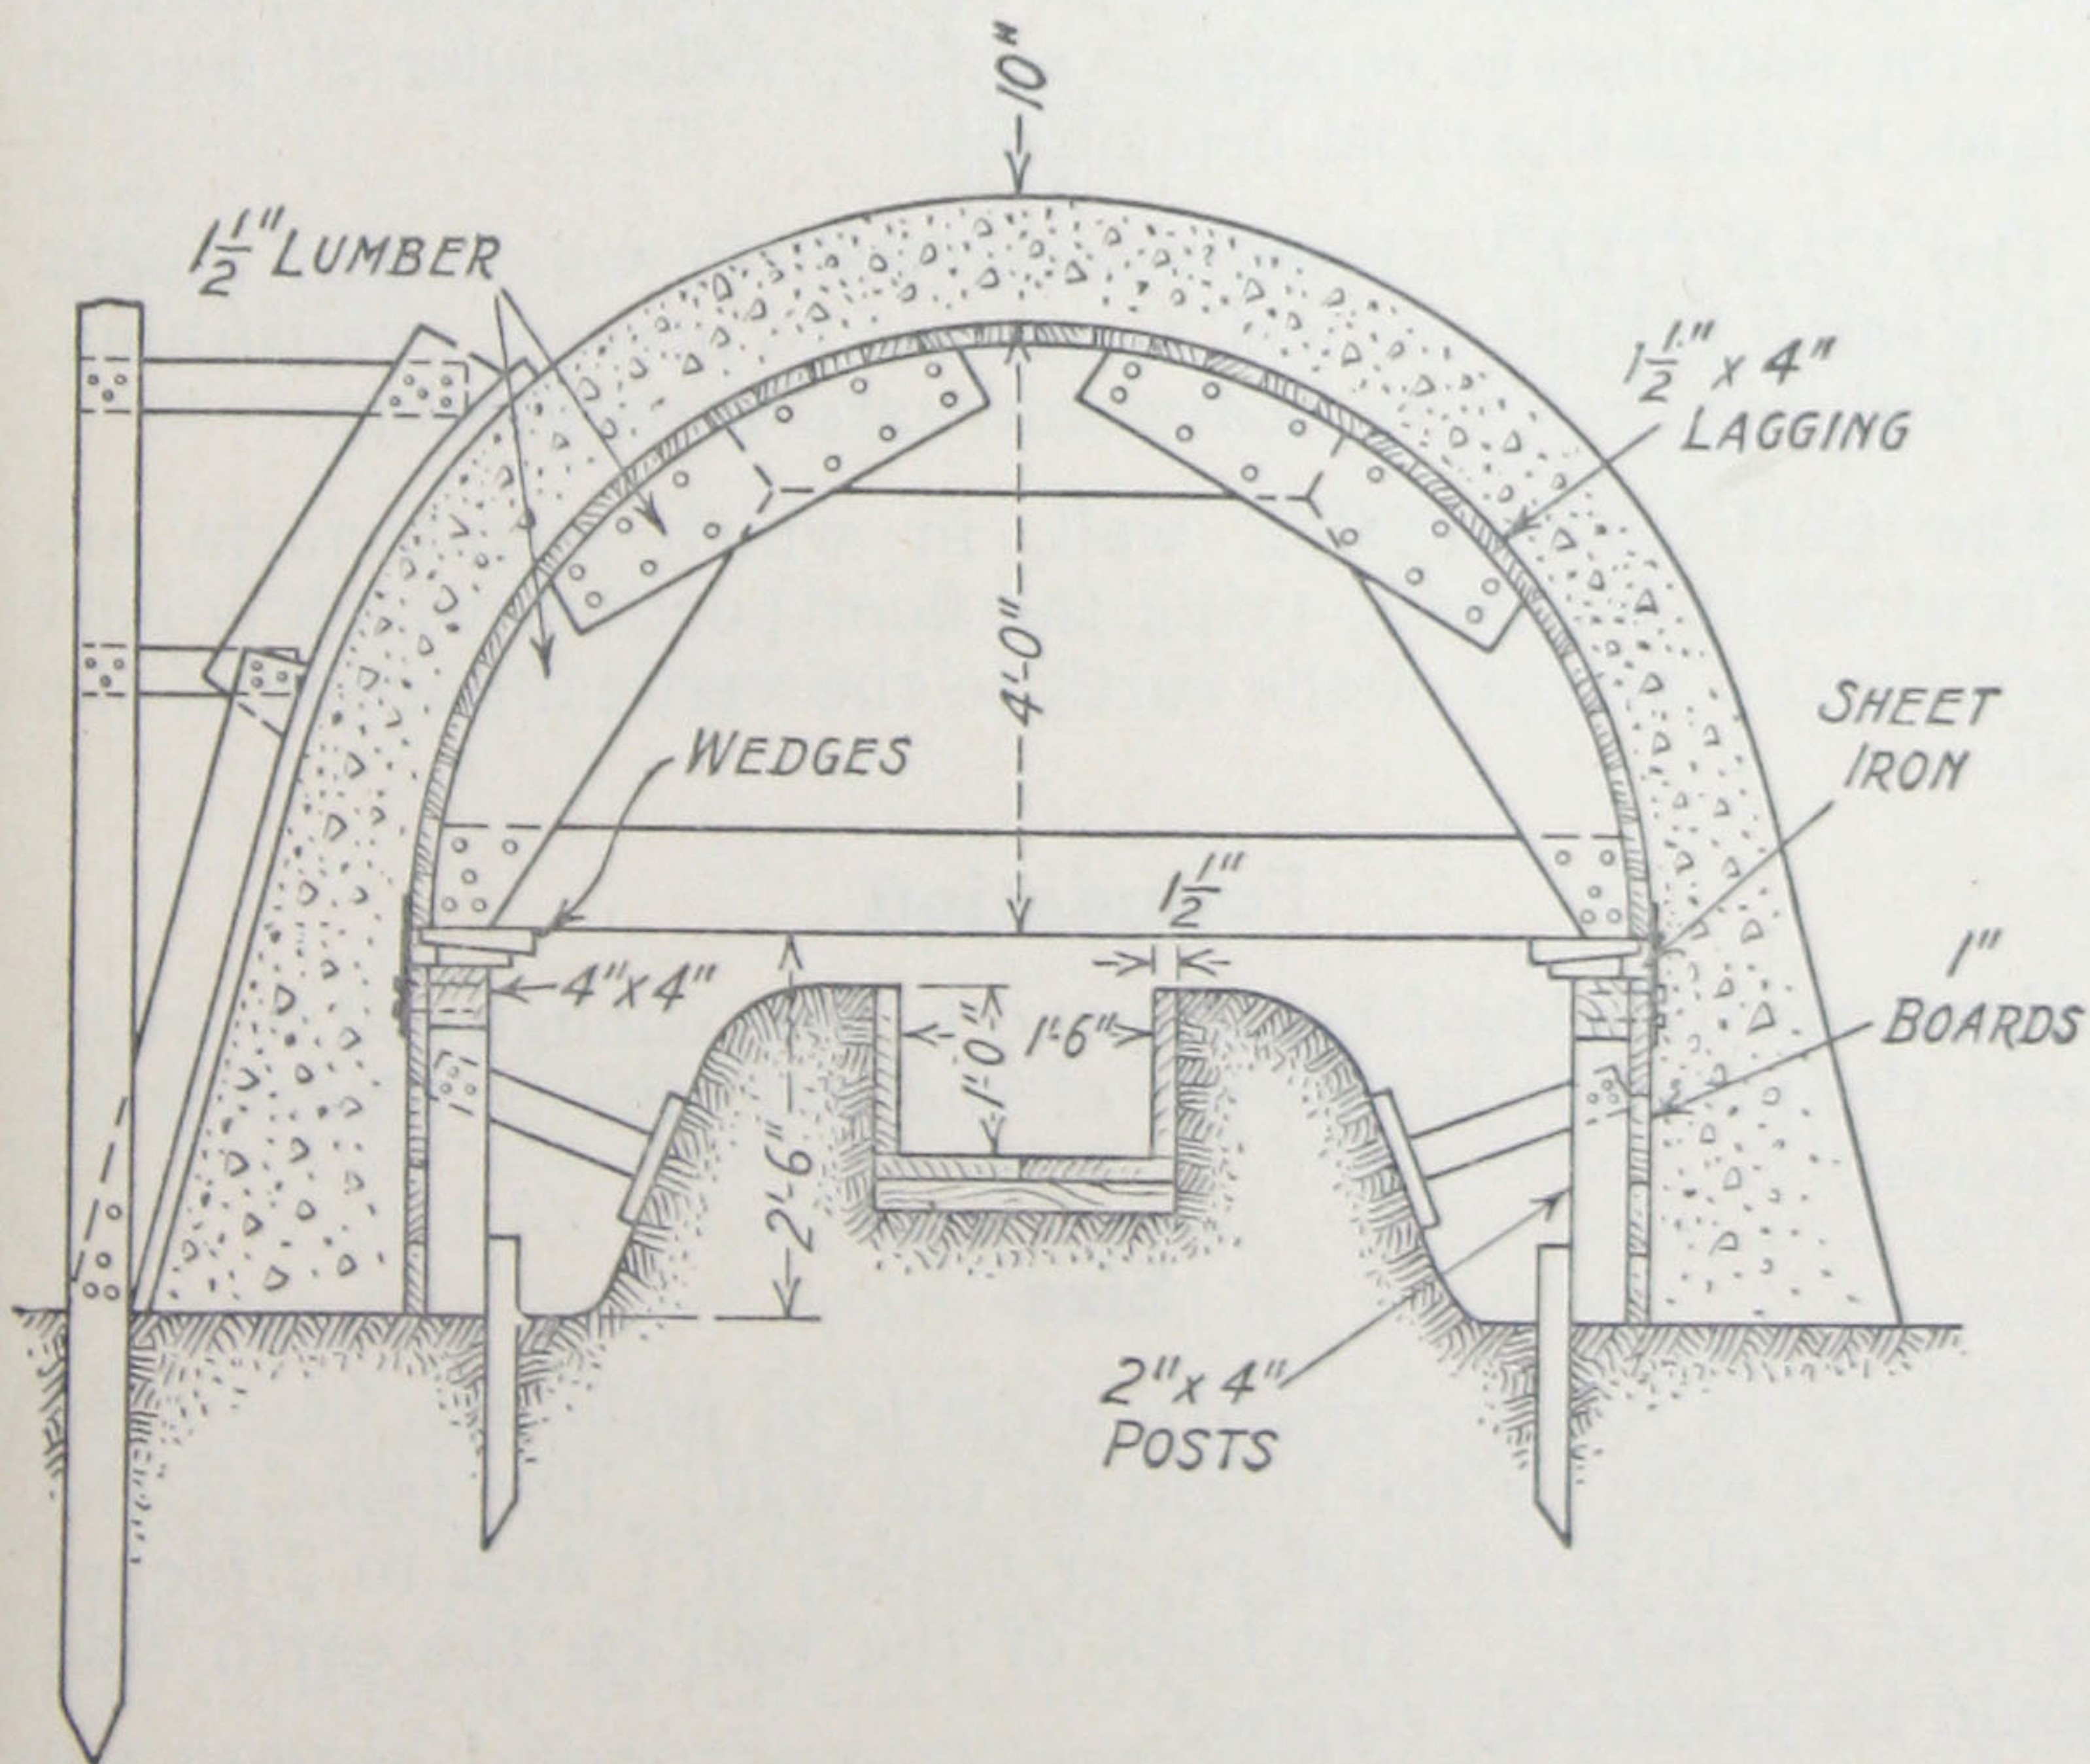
Typical centering for small arch culvert. The details of this centering can be altered to meet local conditions. For larger arches it is wise to provide center posts for additional support.
